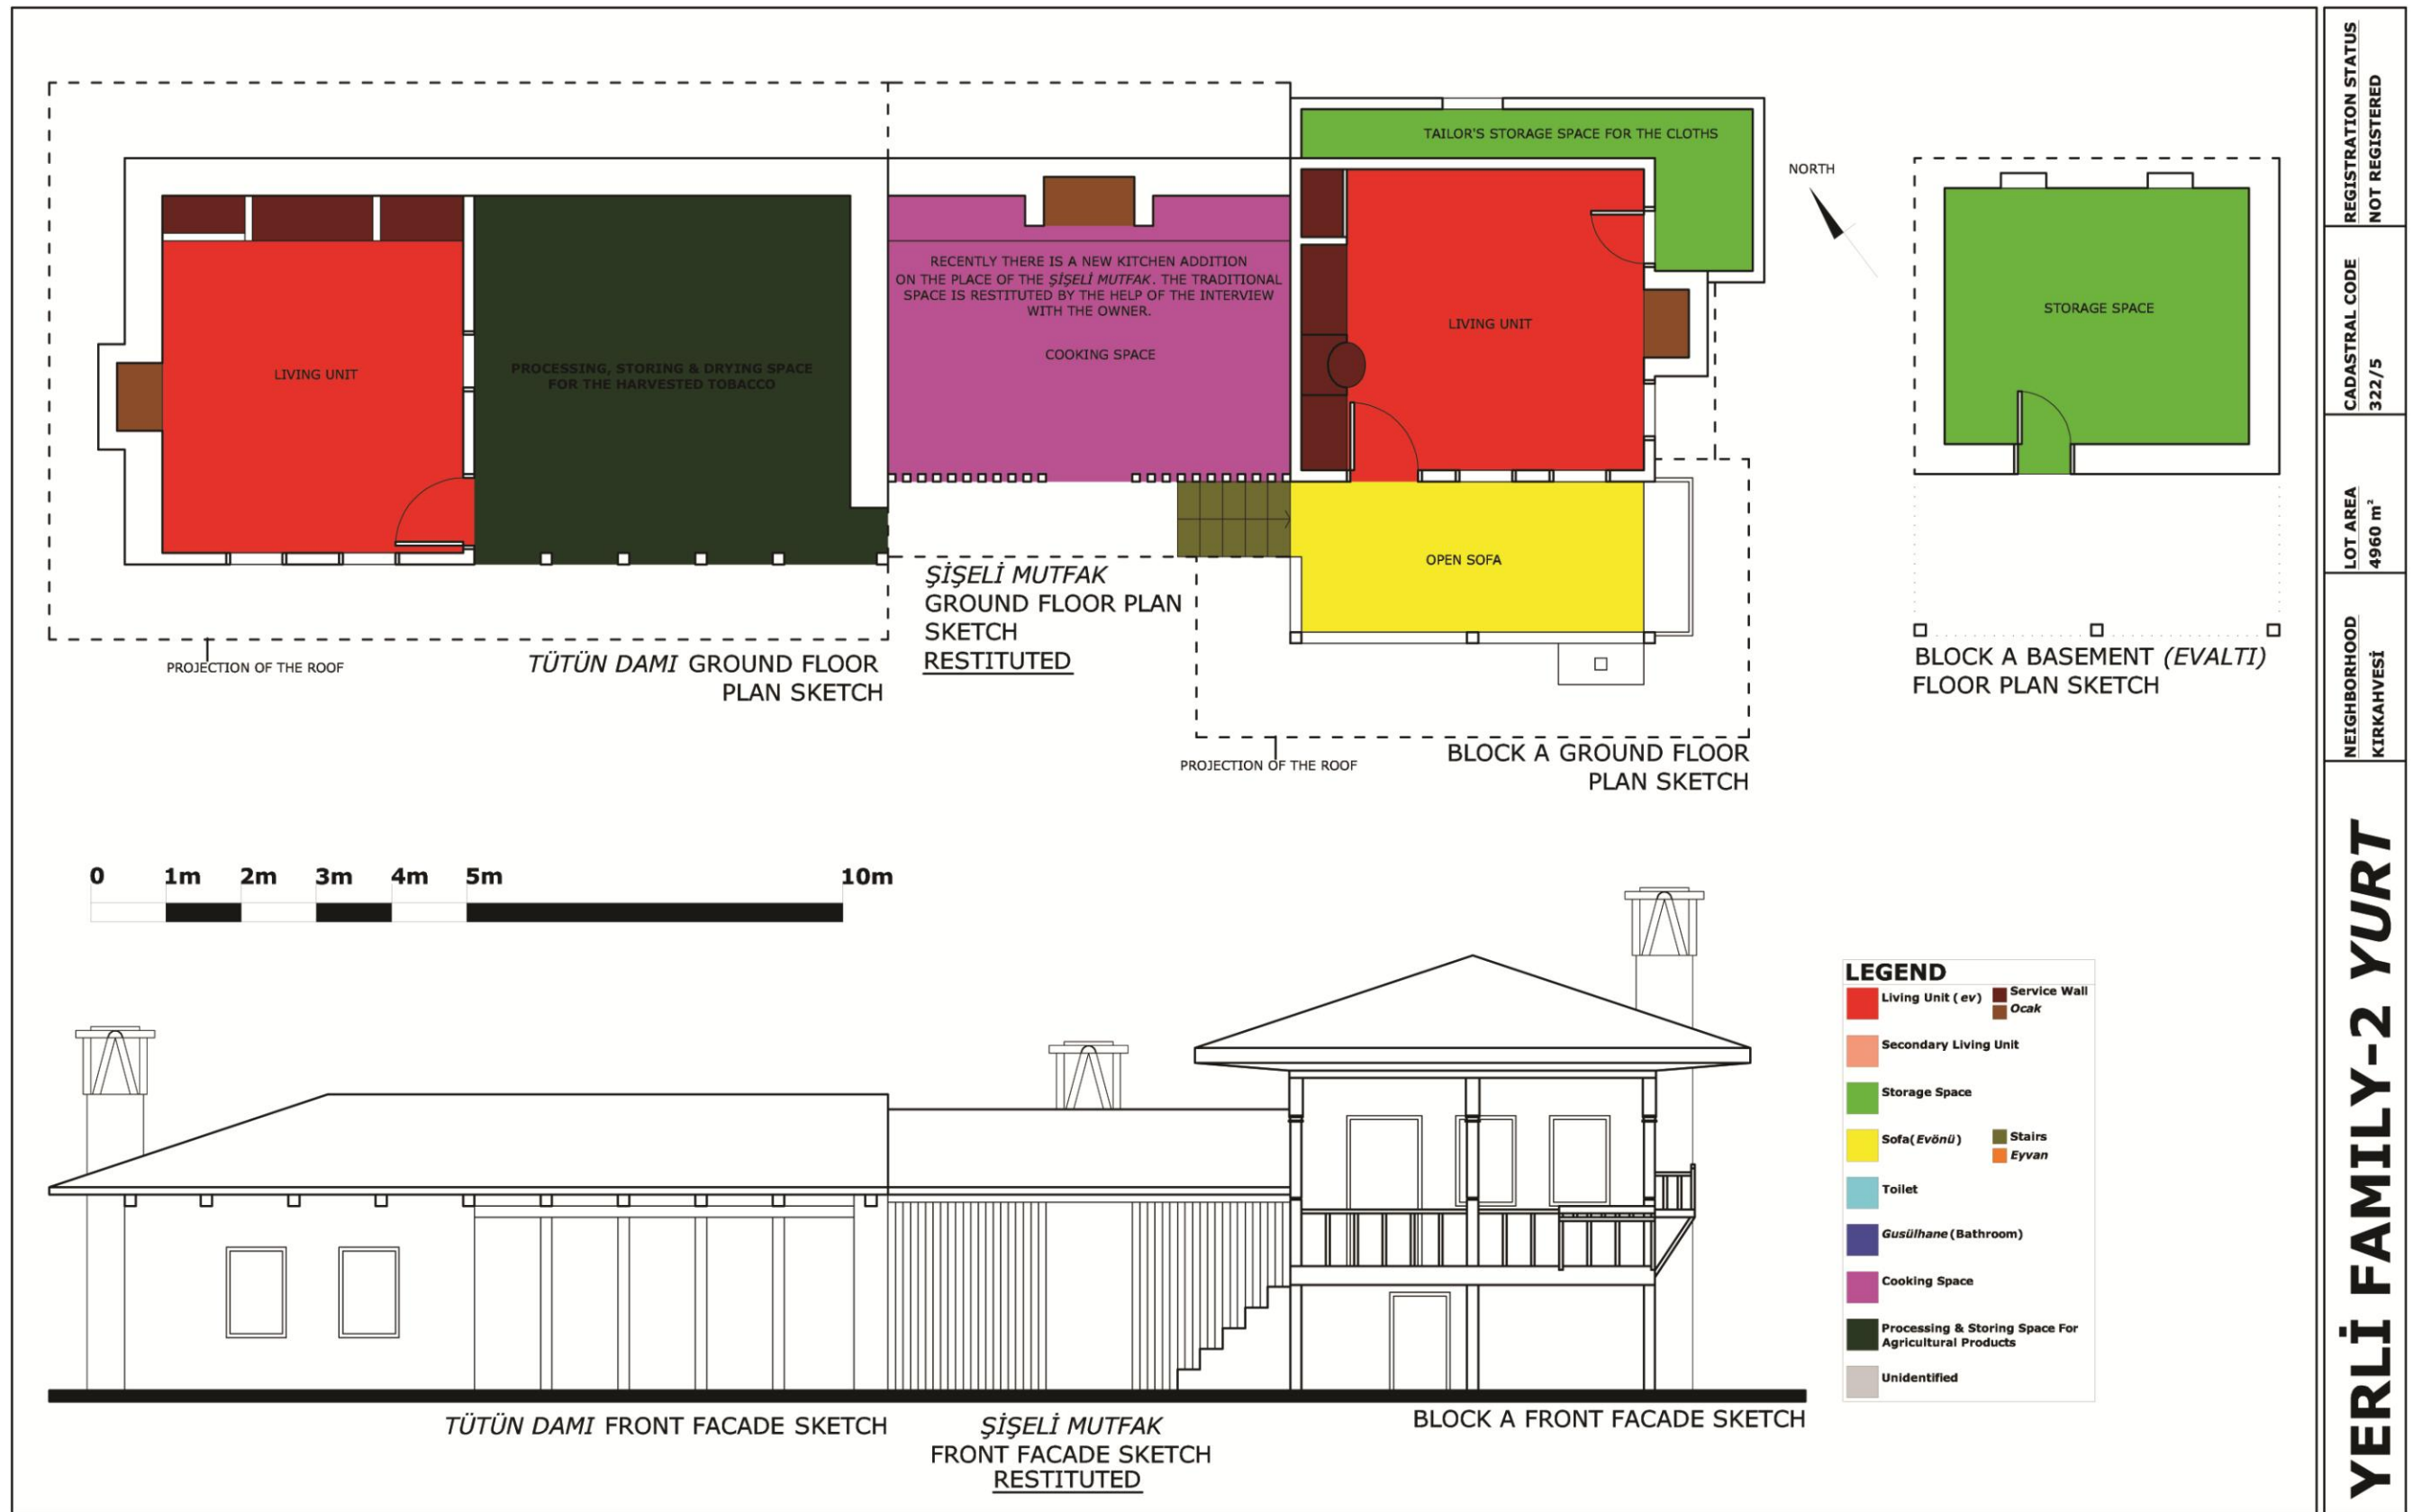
Plan and front façade sketches of the traditional buildings in *the yurt* of Yerli Family-2
